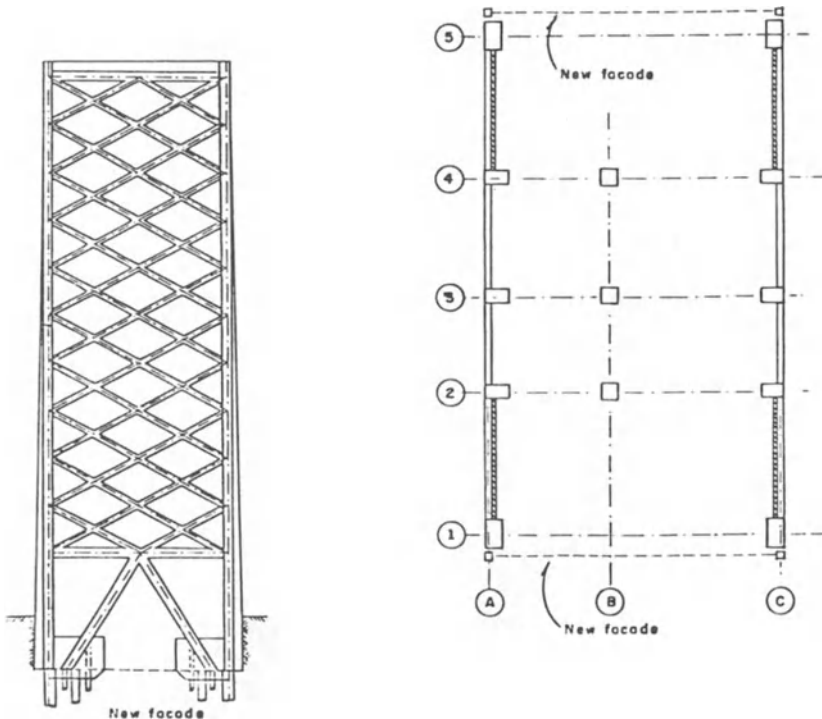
Typical plan and new facades used to reinforce frames, with diagonal steel elements along whole width of building B
